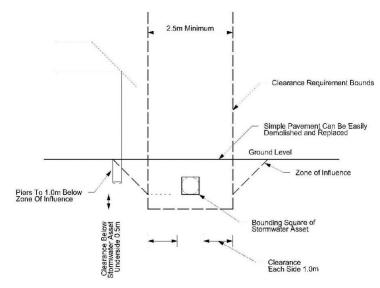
Building ADJACENT to a Sydney Water stormwater asset requirement
